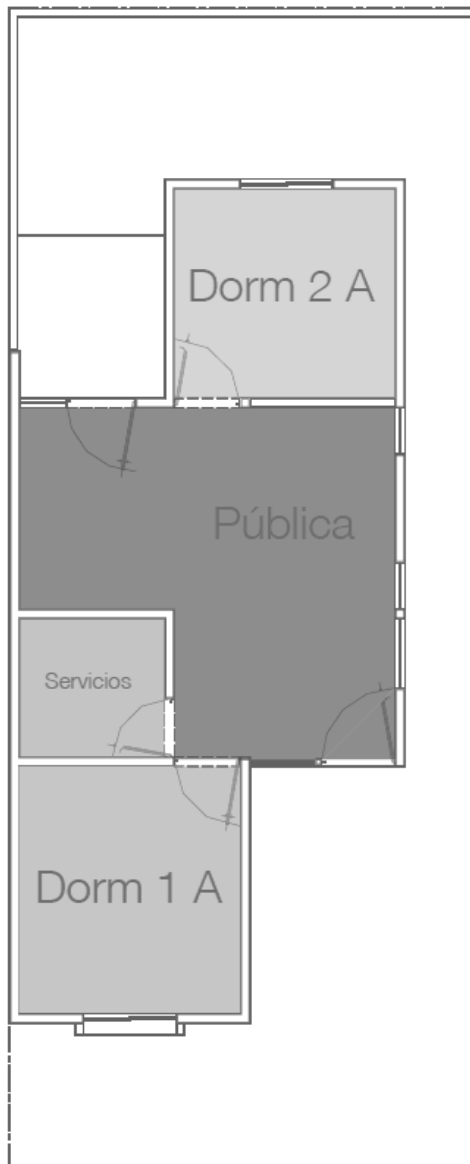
Plan view of a typical social house in Mexico (Campos Arriaga, 2011).
